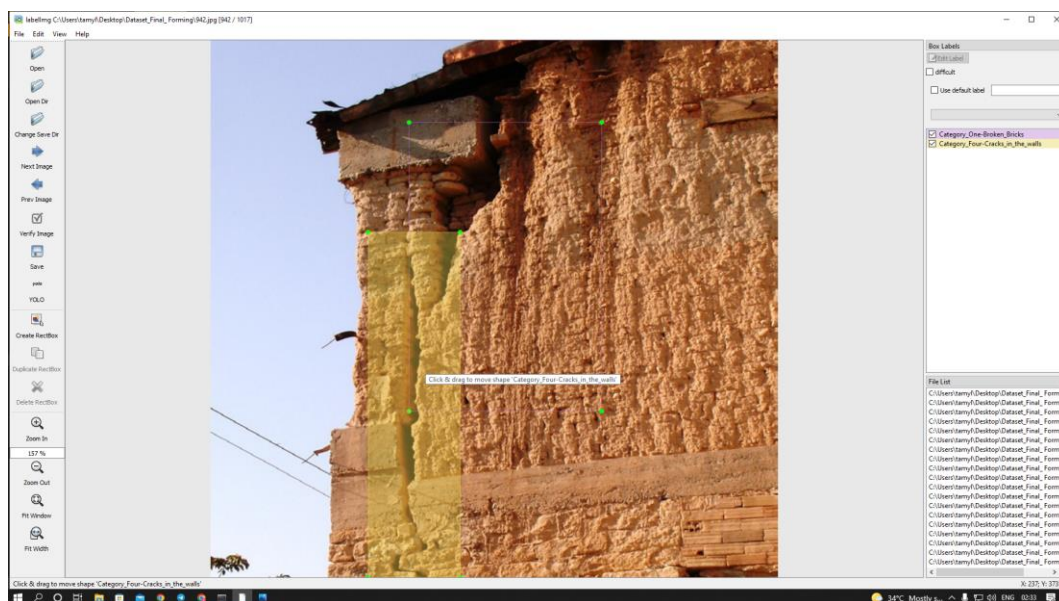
Annotations labels of cracks in the wall and broken bricks
